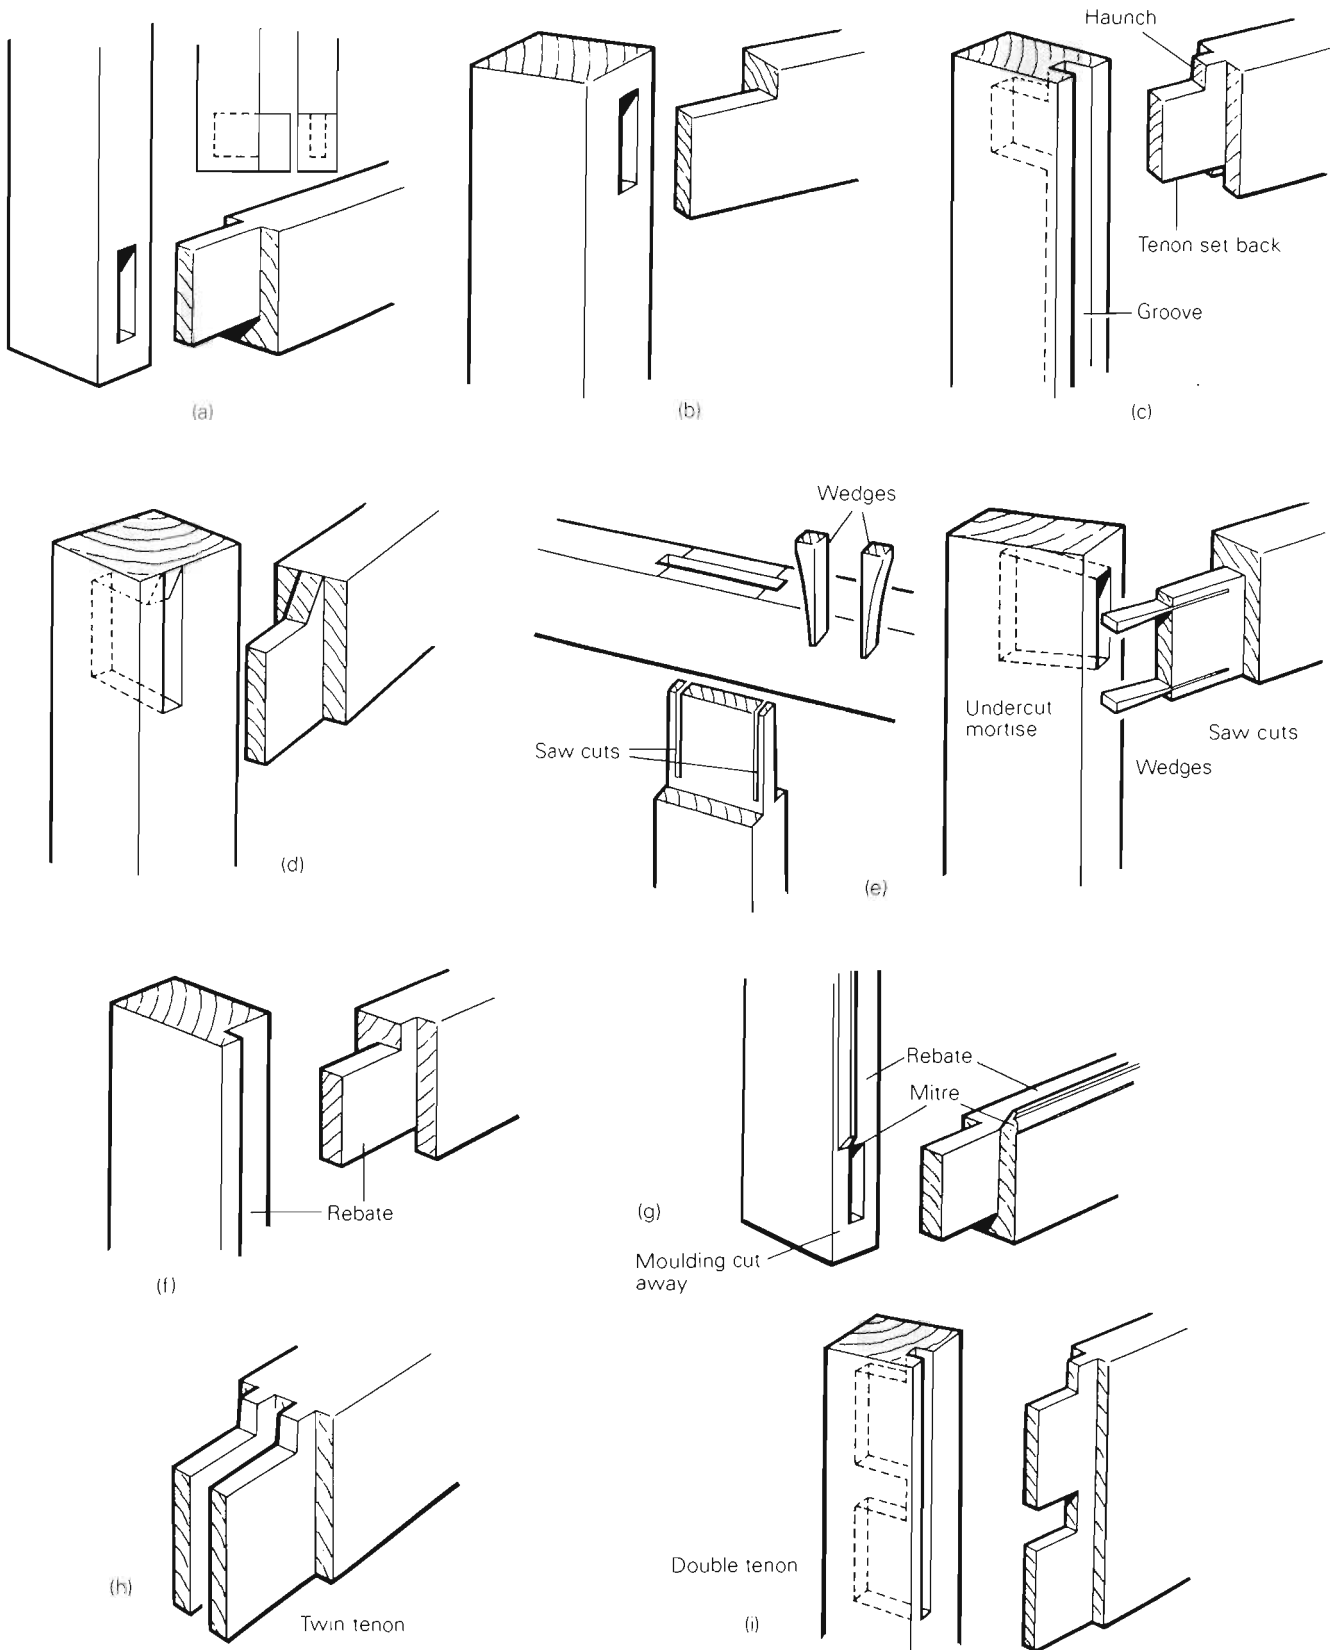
Types of mortise and tenon joint: (a) common, (b) barefaced, (c) haunched, (d) concealed haunch, (e) wedged, (f) long and short shouldered, (g) moulded, (h) twin, (i) double.
